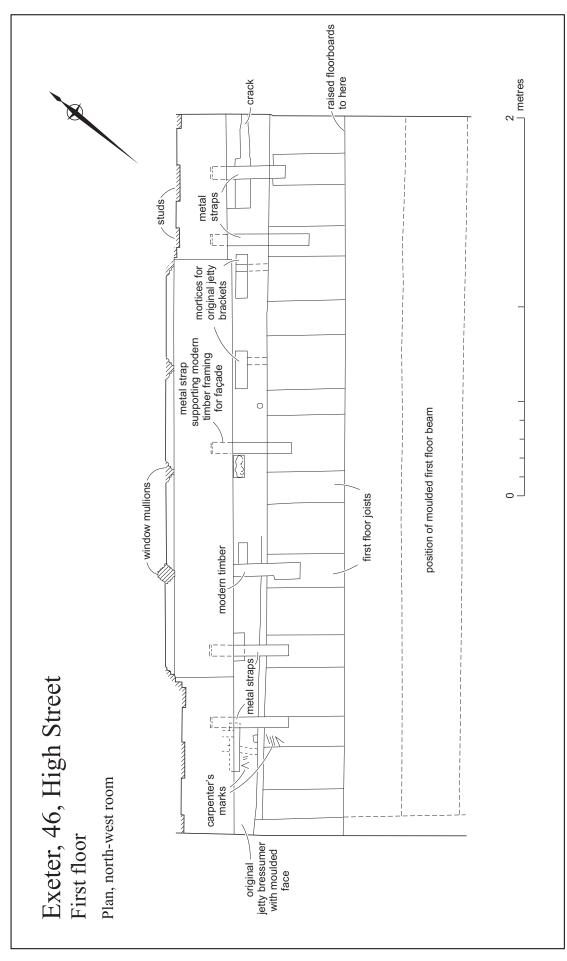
Plan of exposed joists in the first-floor north-west room. Scale 1:20.
